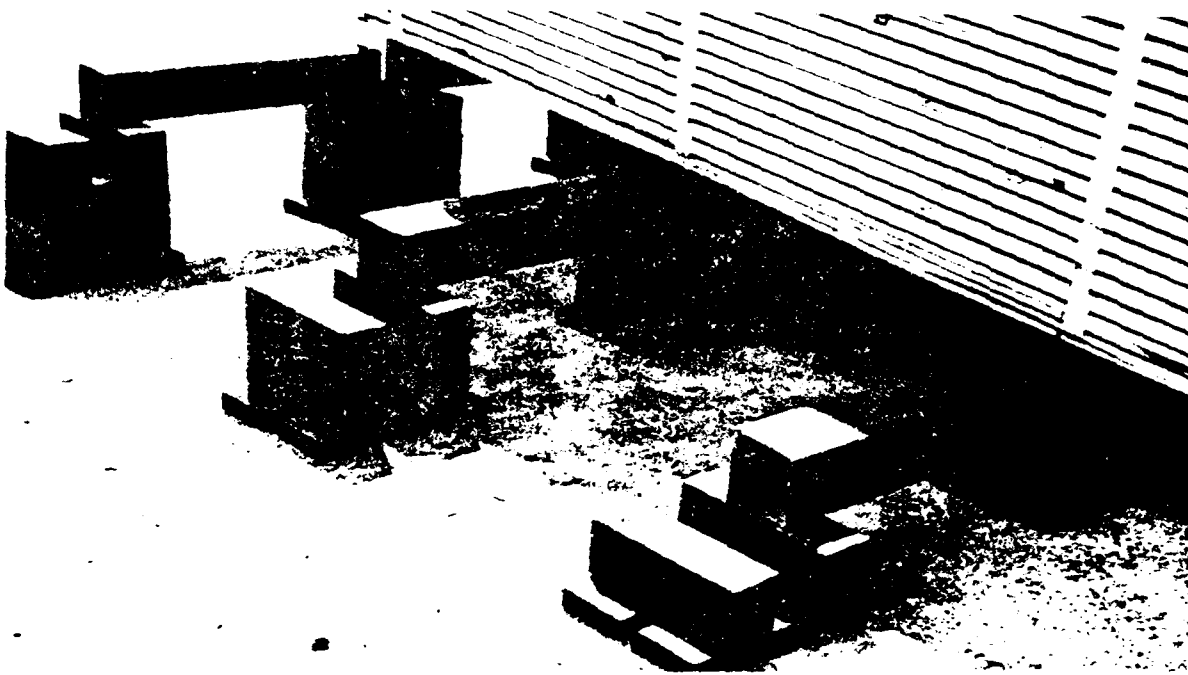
Portable lumber foundation spaced on 5-foot 4-inch centers.
